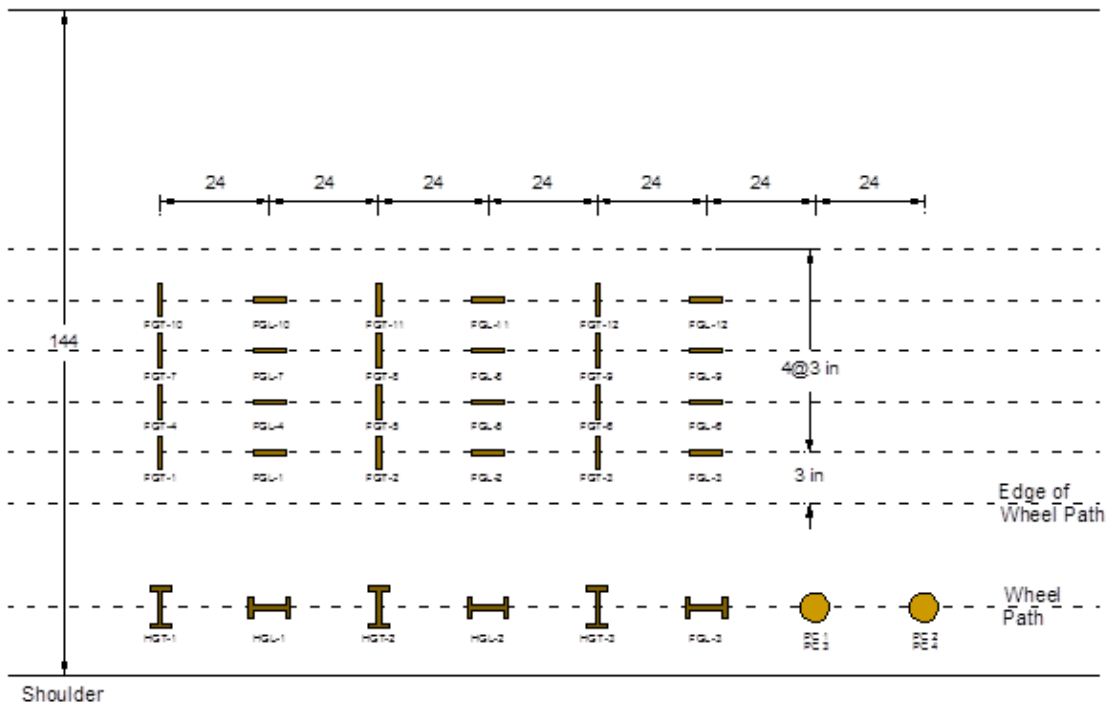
Illustration. Plan view of pavement structure and instrumentation for the test pit section.
